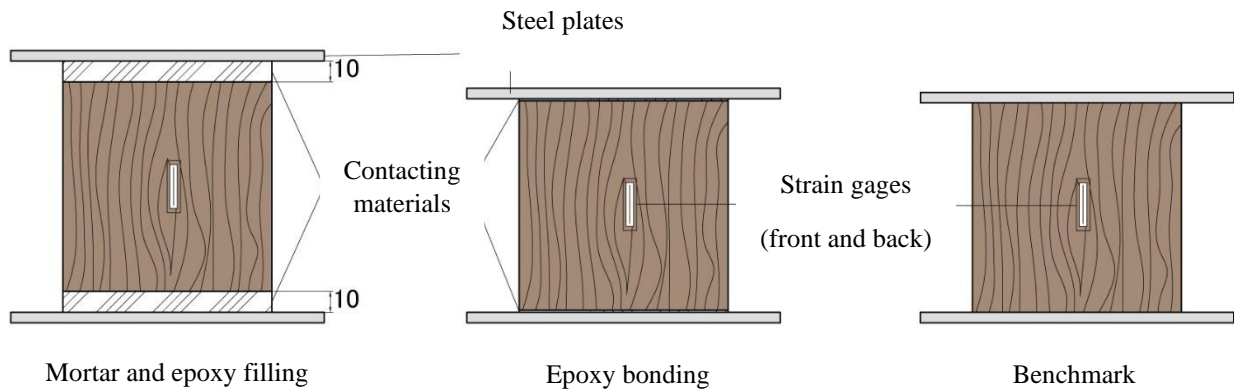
Specimens of steel plate only, mortar filling, epoxy filling, and epoxy bonding.
